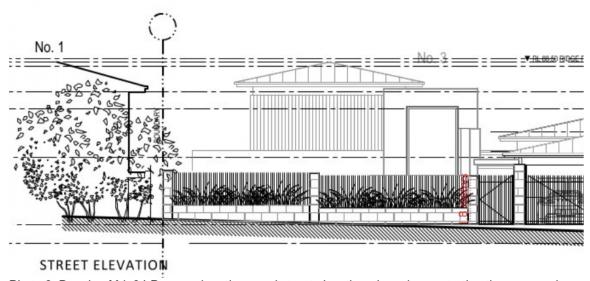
Drawing Md_04 Proposed northern and street elevation plans demonstrating the proposed reduction to bulk at first floor level.
